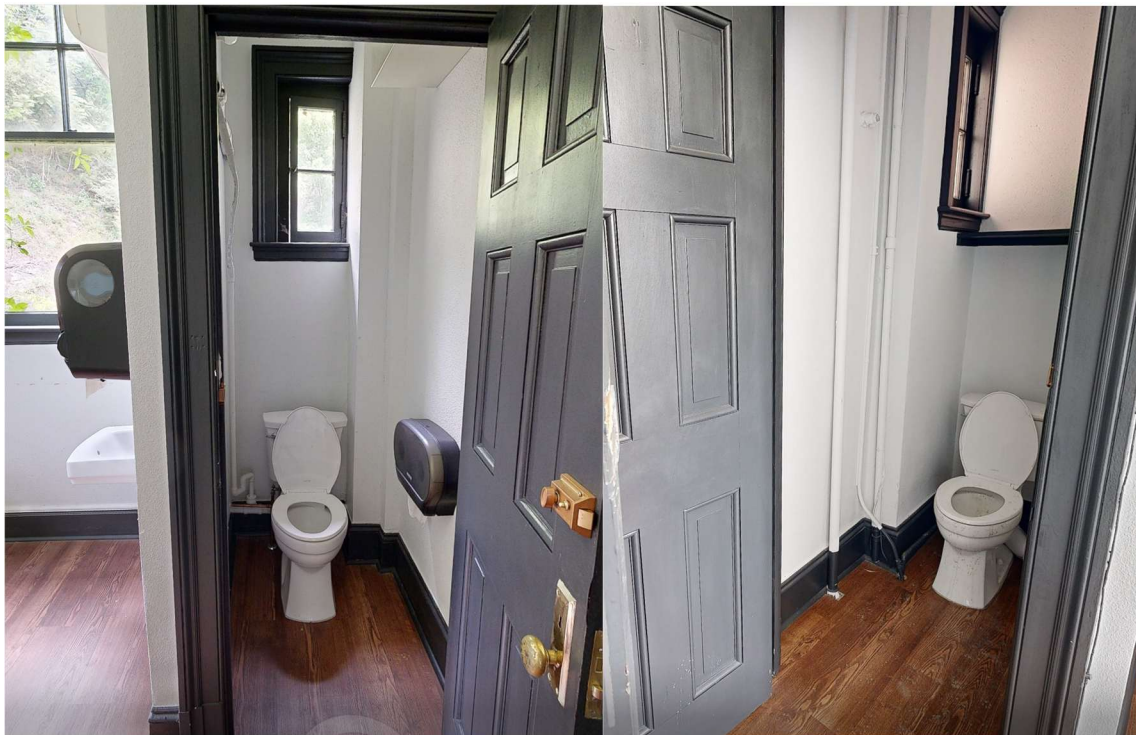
Existing restrooms on the second level, plan East of the existing courtroom.
